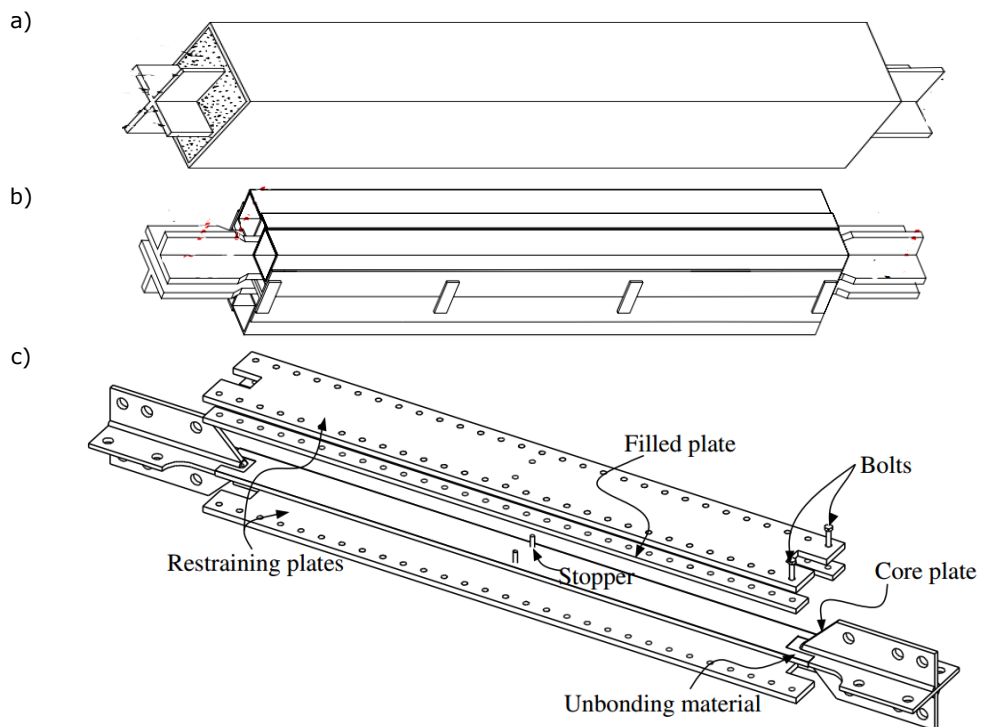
BRM geometries of a) "conventional" BRB (typical) [66], b) welded [73] and c) bolted "dry" BRB [74]
